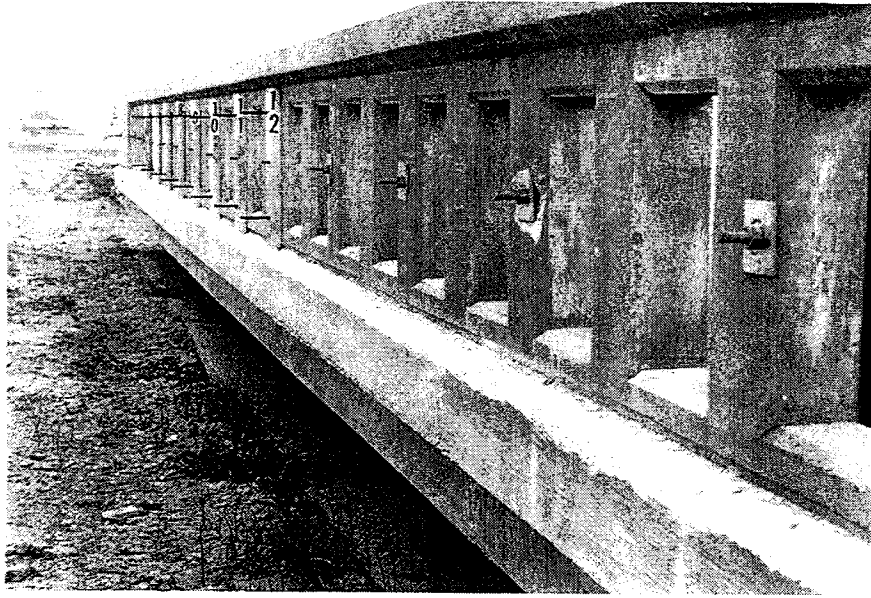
W-beam retrofit for baluster bridge railing (field side view).
